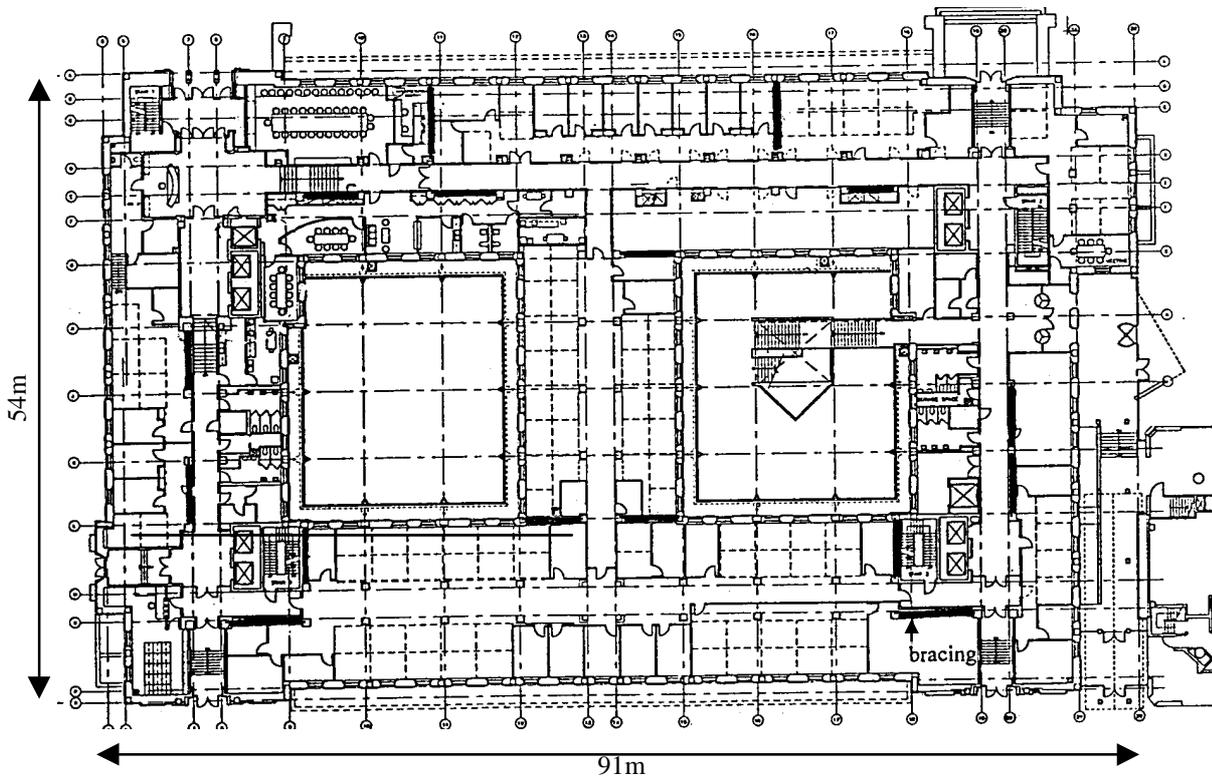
Typical floor plan showing location of bracing with Pall Friction-Dampers
